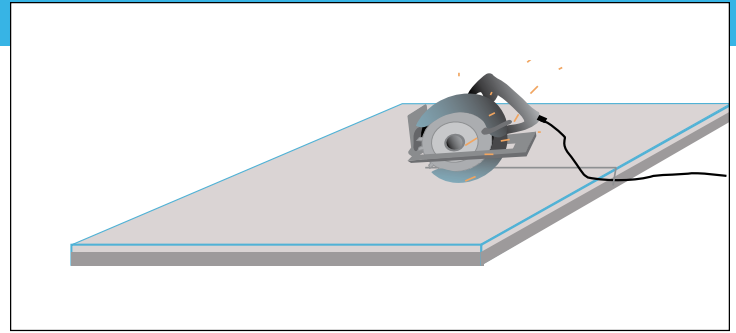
Cutting QuietRock® 530RF panel with circular saw
